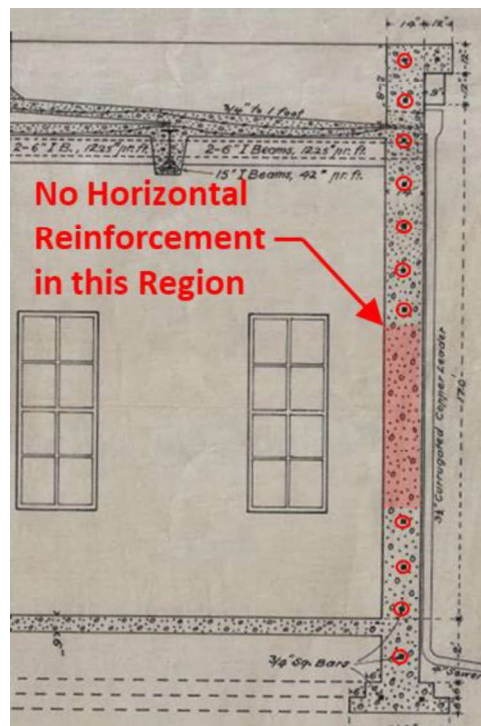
Walls With Insufficient Reinforcing Steel to Resist Seismic Forces
